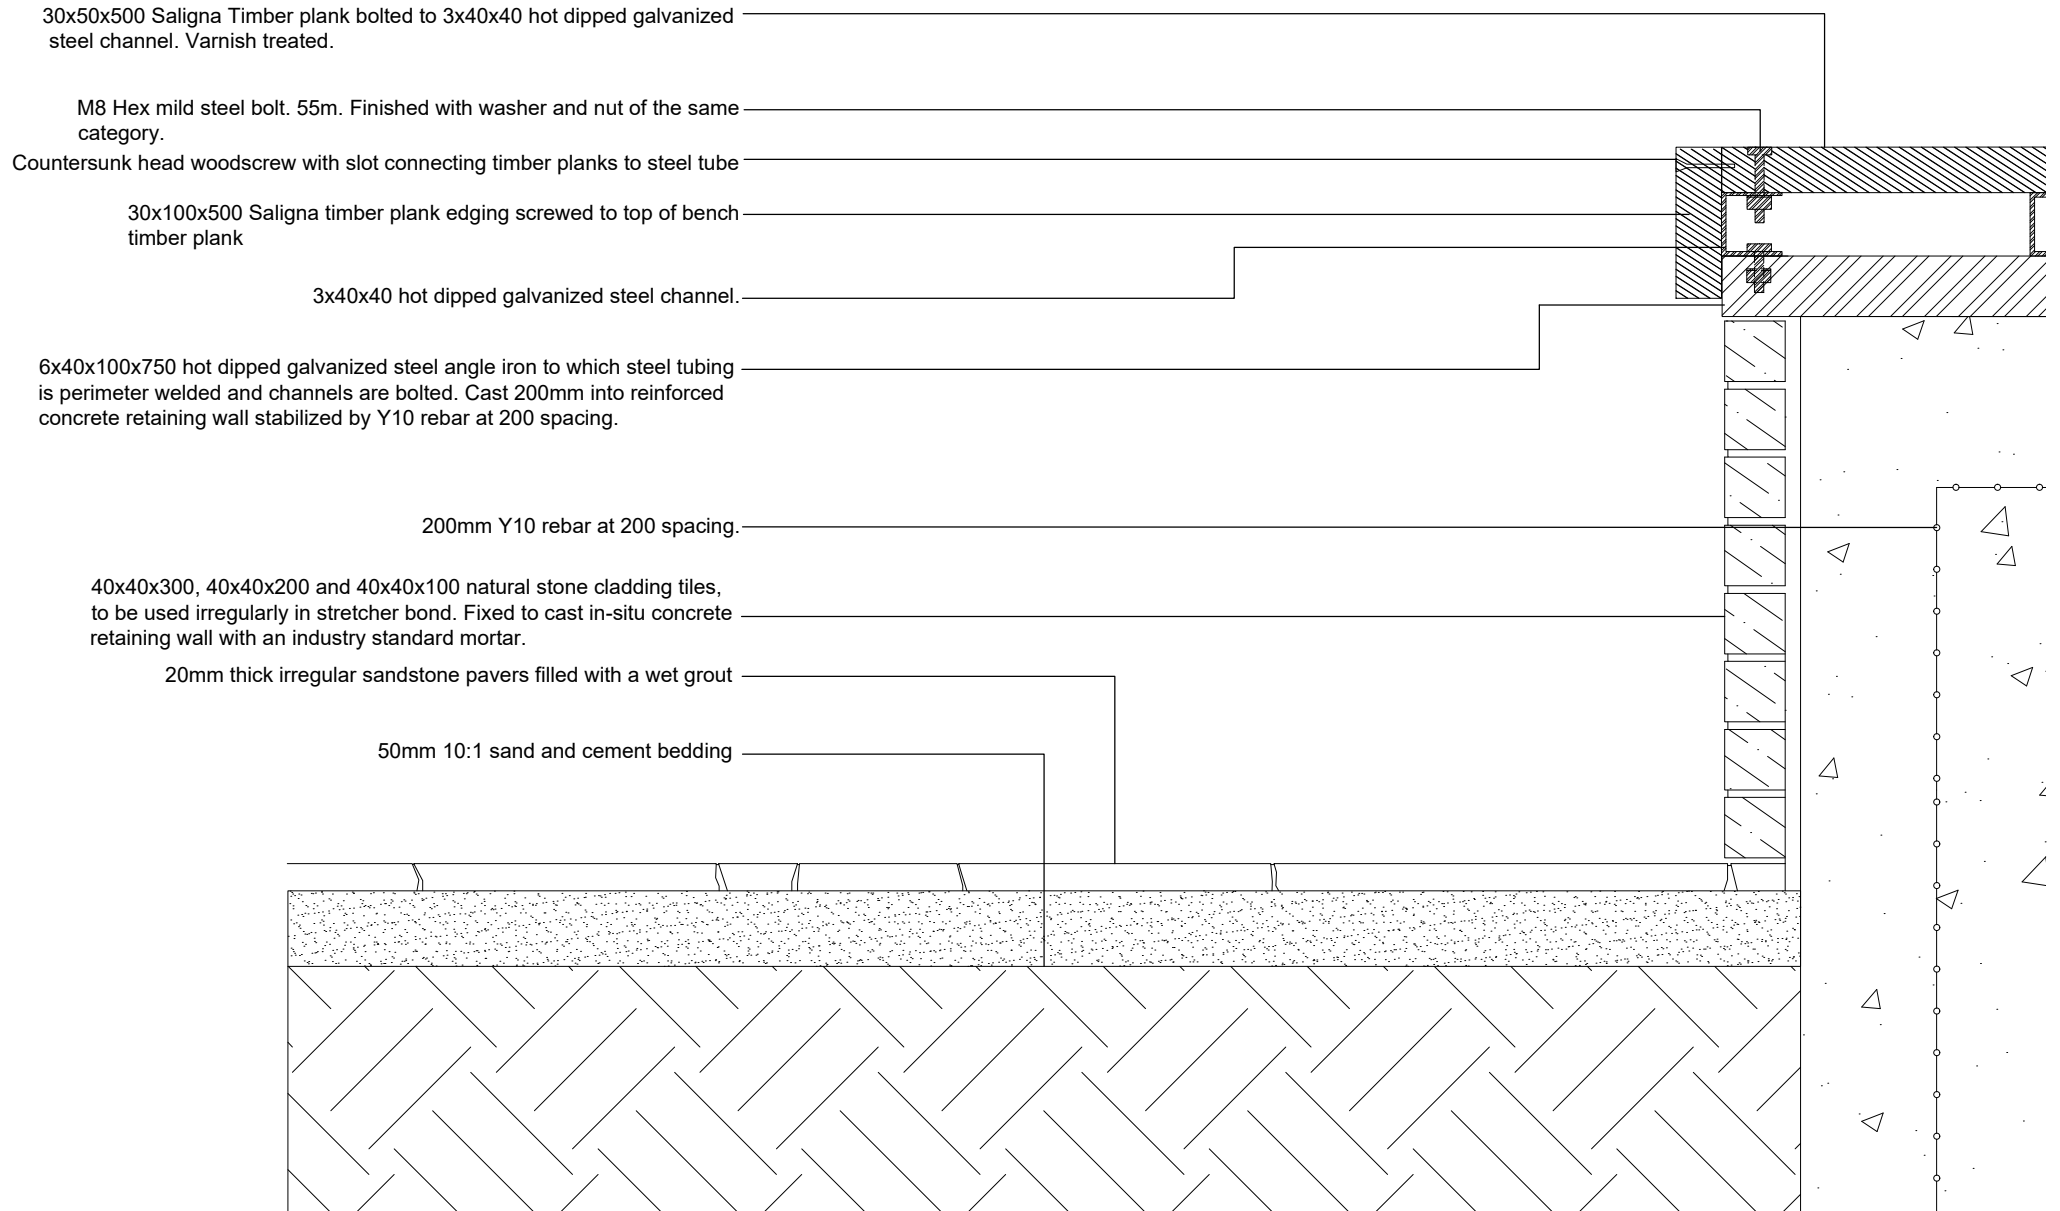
Seating bench for green roof construction detail (Author, 2015)
